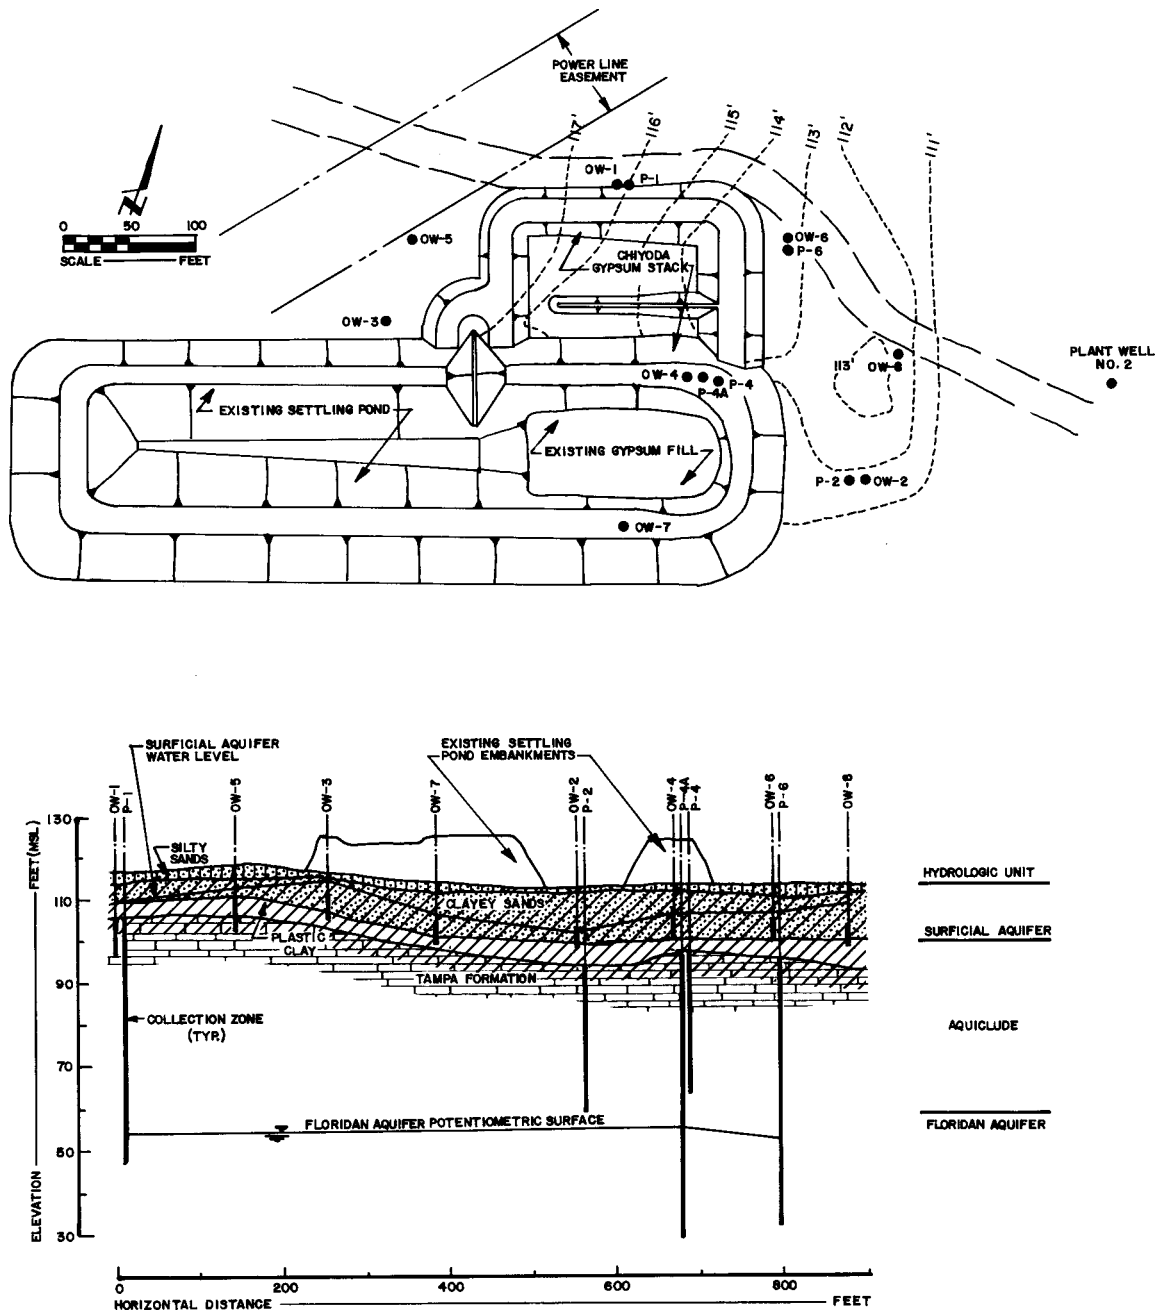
Groundwater Monitoring Location Plan And Profile
